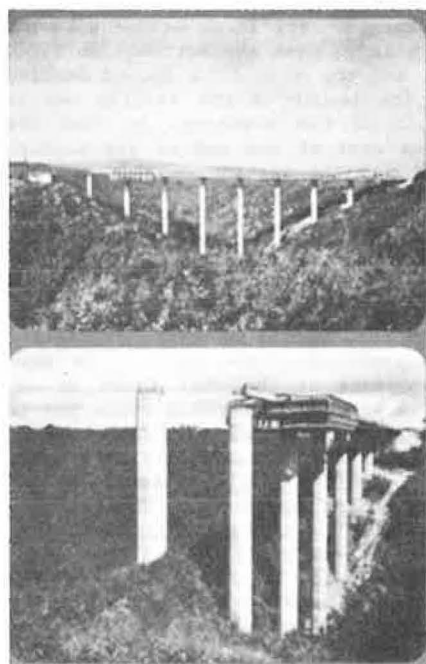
Span-by-span T-girder construction with below-deck erection trusses.
